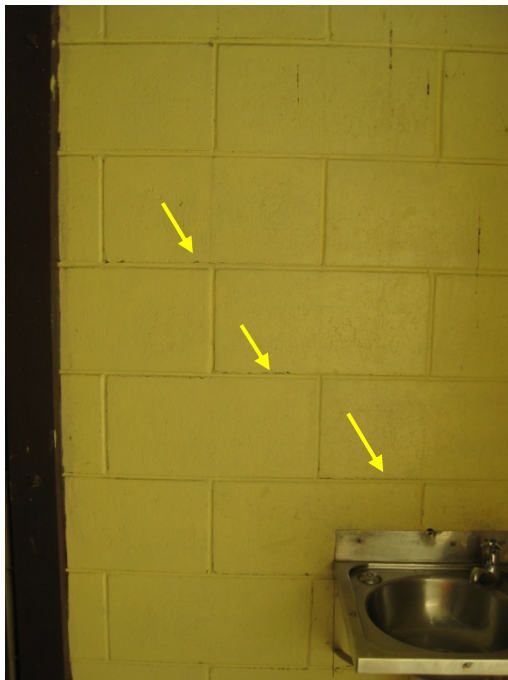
Hairline cracking along Mortar Joints on North Wall inside Ladies
